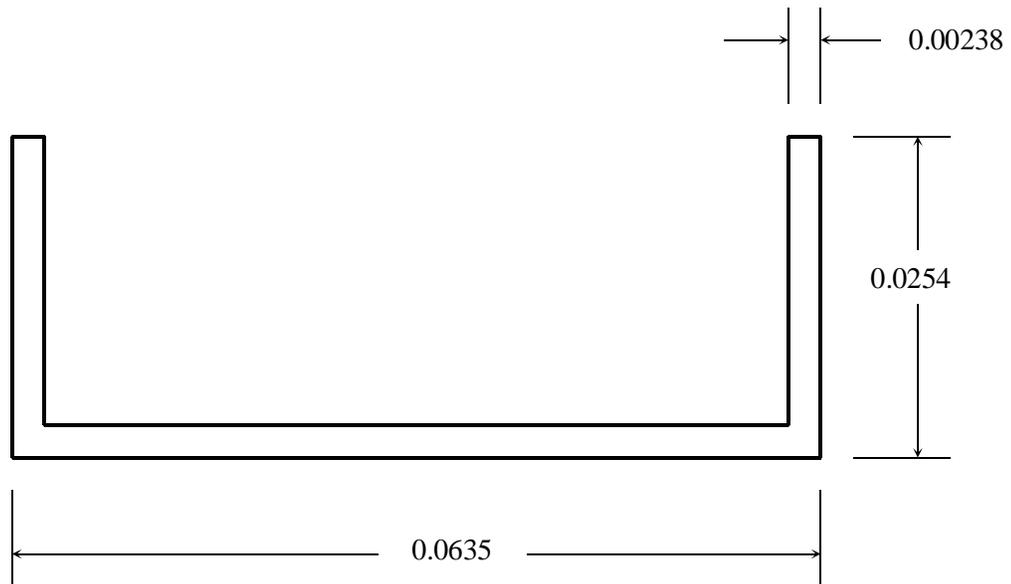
Cross-sectional geometry of the horizontal floor beam and vertical floor support beam elements (dimensions in m).
